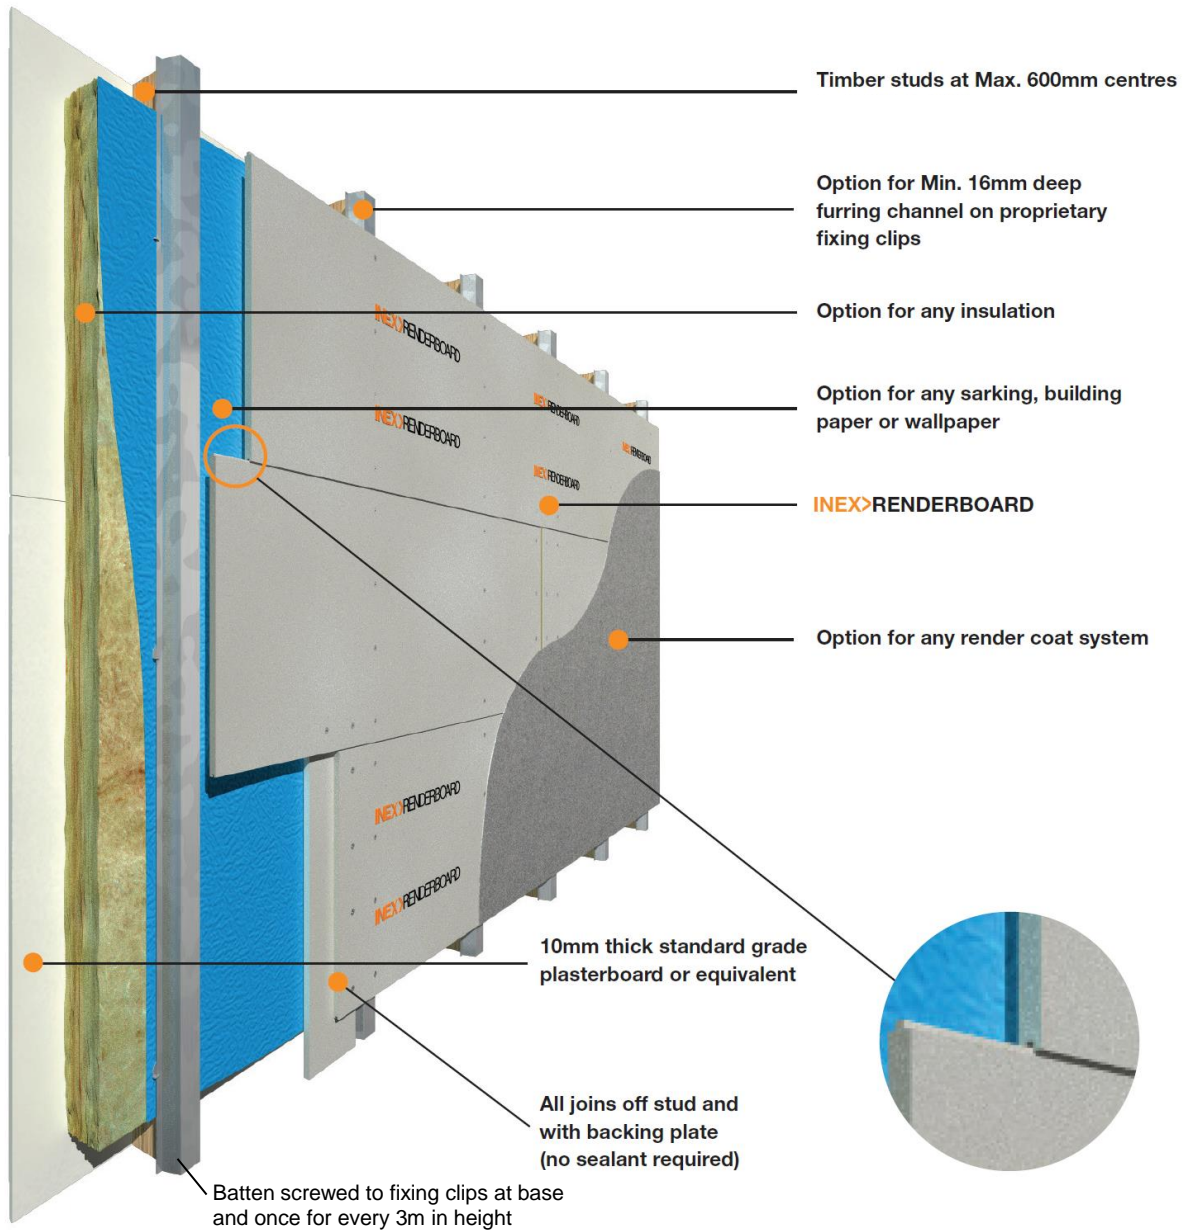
Horizontal INEX>RENDERBOARD Wall System Timber Frame – General Arrangement
